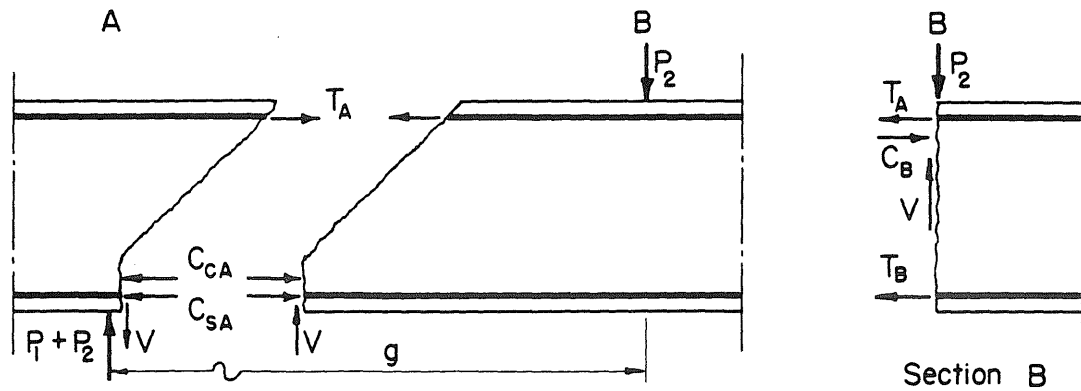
CONTINUOUS TOP AND BOTTOM REINFORCEMENT BOND DESTROYED IN RESTRAINED BEAM WITH ONE CRACK
